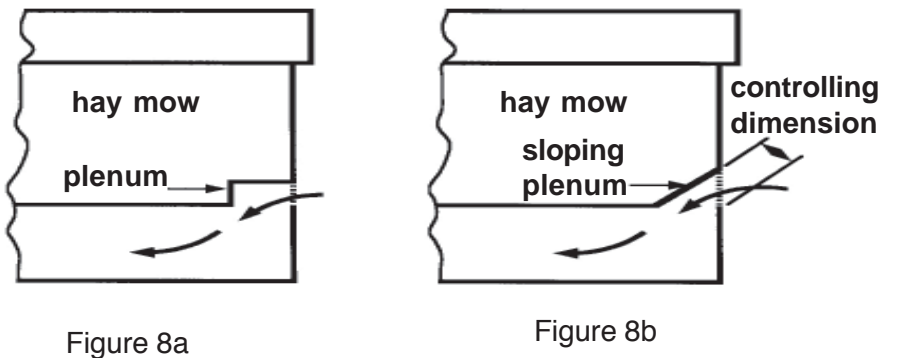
Two-story barns with heavy stone-end walls or one-story obstructions will require extra construction for inlets. An air plenum in the hay mow will allow air to be drawn over the stone wall and into the animal area. If no obstructions exist at the end of the barn, this can be done with a simple plenum (Figure 8a). Typically, the opening from the plenum into the animal area is sized as the controlling opening. However, the area entering the plenum from outside should be at least as large so as not to block air flow. Consider the area occupied by floor joists, building supports, and screening when sizing the inlet area and plenum. Use sliding doors or curtain material to control the opening. If a sloping plenum is used, the shortest distance from the wall to the plenum becomes the controlling dimension (Figure 8b). If hay or other material is to be stored on the plenum, proper structural techniques must be used during design and construction.
